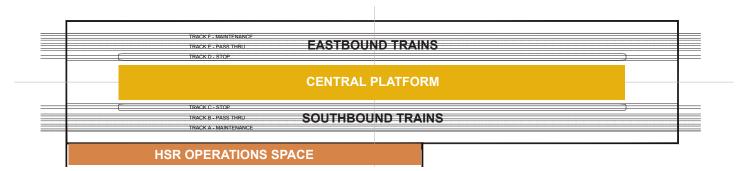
PLATFORM PLAN VIEW - LEVEL 3
